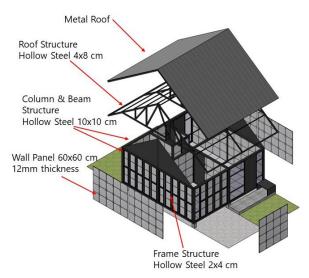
Exploded Axonometry of Prefabricated Housing Prototype Design
